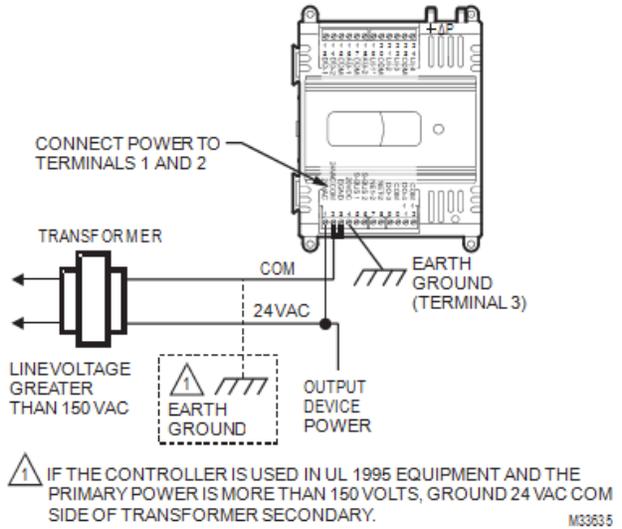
Transformer power wiring details for one controller used in UL 1995 equipment (U.S. only)
